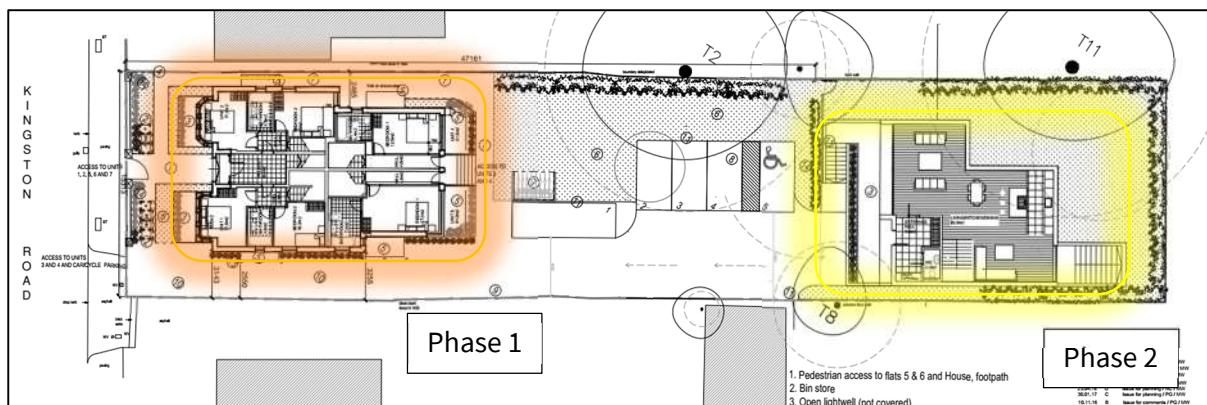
Proposed Site Plan, drawing reference: 240 2 PL(10) P00
